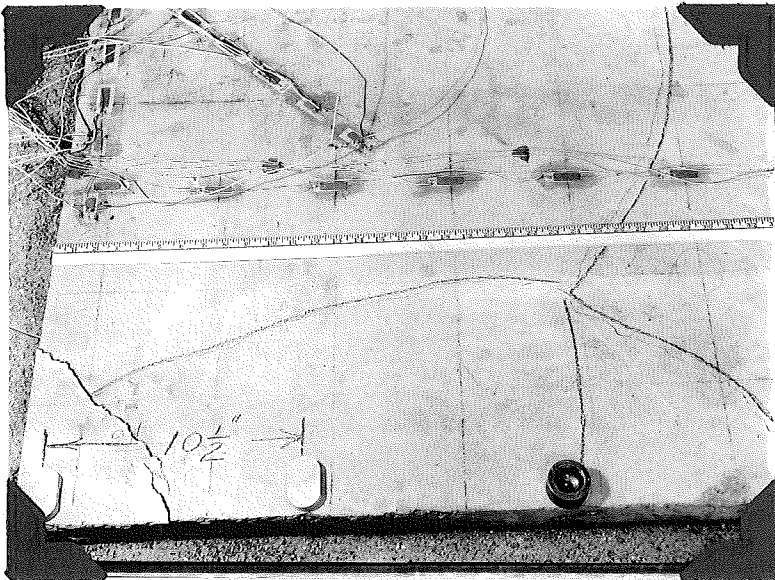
Left foreground: break due to tandem load. Right: cracks formed when load was applied on 1-3/4 in. circular plate at slab edge.
